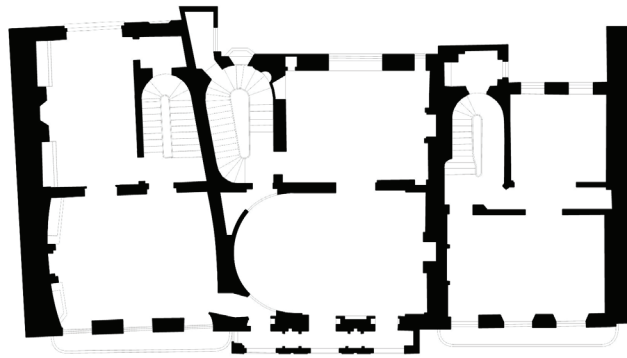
First Floor Plan Sir John Soane's Museum, scale 1:400
